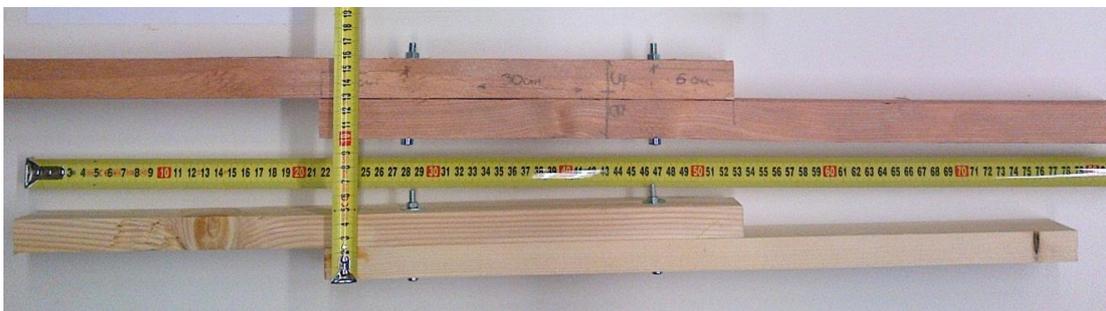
Longitudinal connection with the overlap – testing sample [by author 6/2015]
